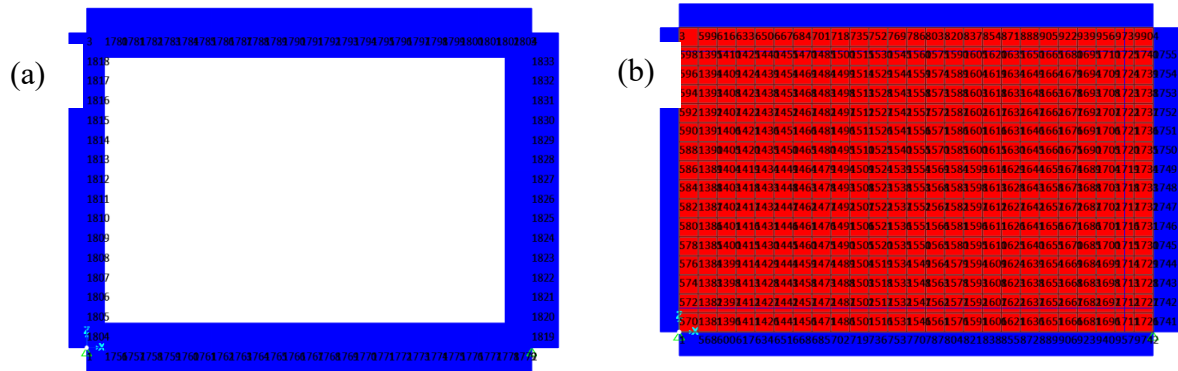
model of the frame (a) without an infill panel (b) with an infill panel
